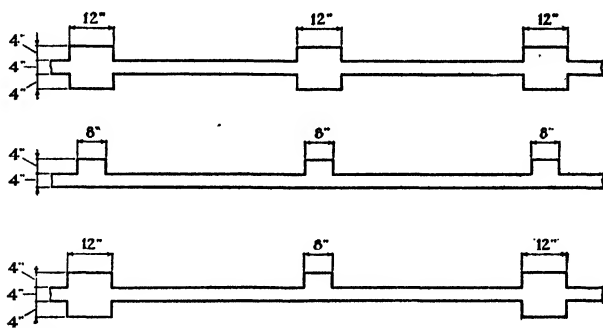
Three types of pier and panel 4-in. wall. The middle type is standard Economy wall.
